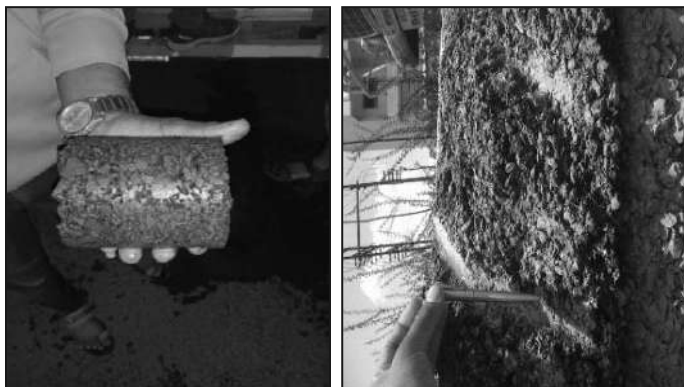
Trial Pit & Bituminous Core in Existing Pavement before White Topping Overlay Design
